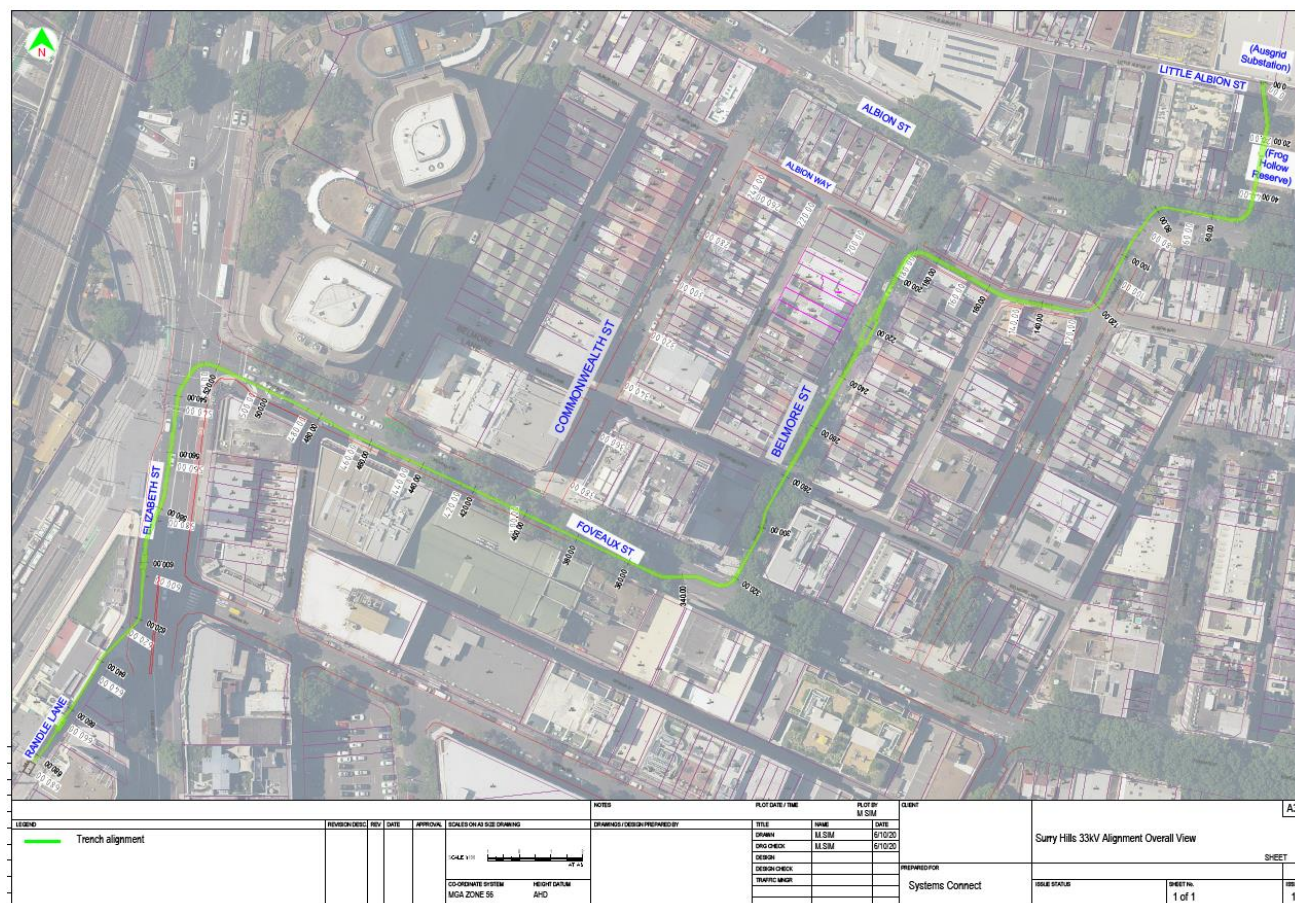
Overall view of the 33kV trench alignment at Surry Hills from Randle Lane to Little Riley Street, Surry Hills.
